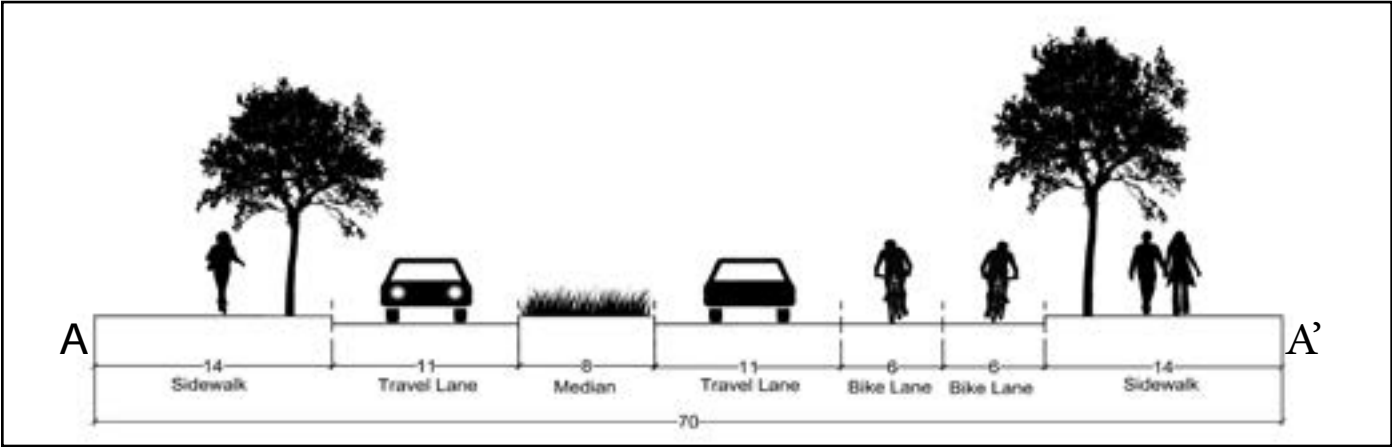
Example Atascadero Road Cross-Section A'-A
